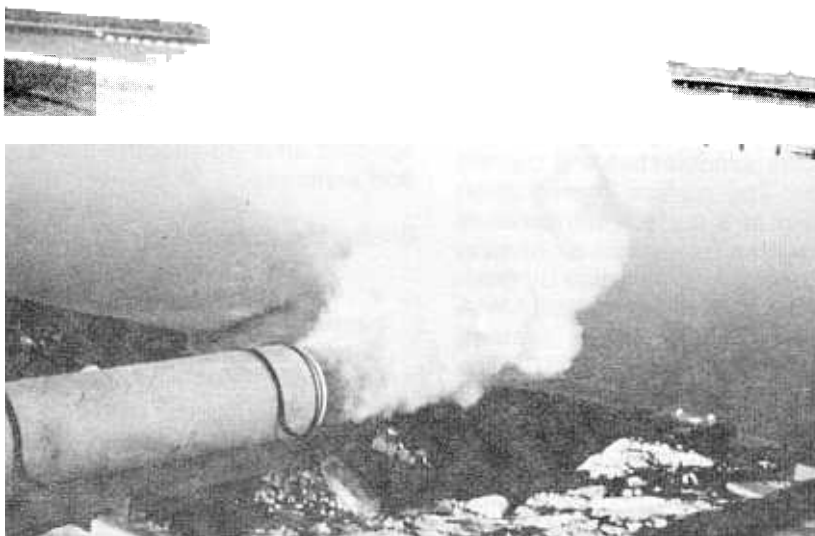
End of bypass No. 1 pipe discharging waste steam. Cracking caused by thermal stresses occurred shortly after the pipe was put into service. Photo 801-D-80849
